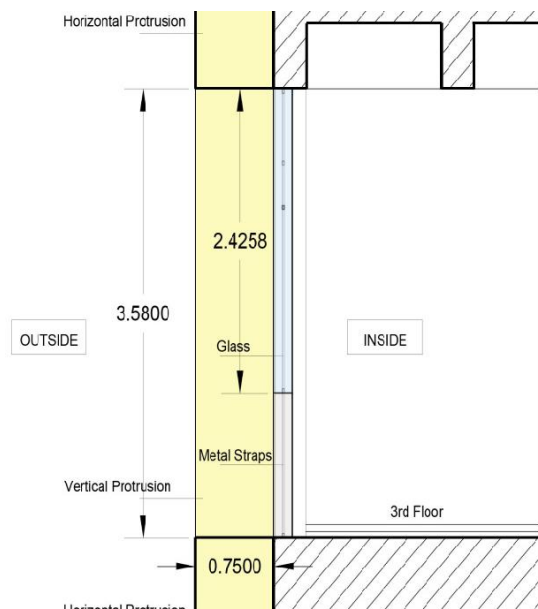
A detailed wall section at the windows is provided, with the protrusions highlighted in yellow
